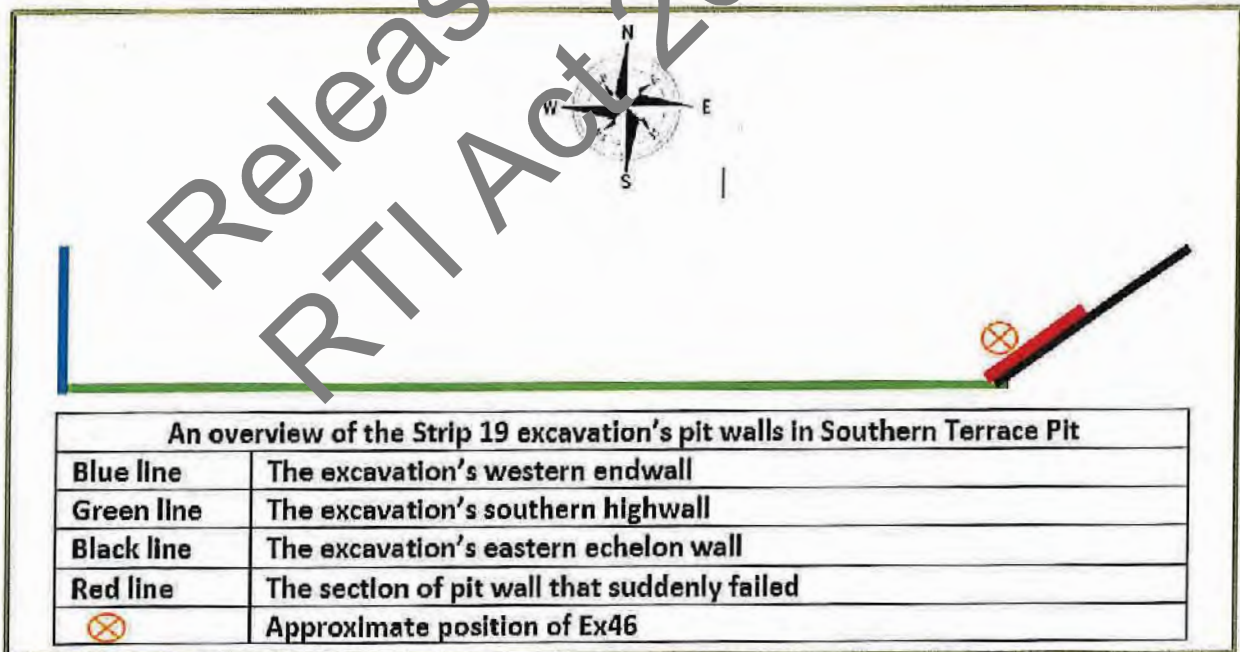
An overview of the Strip 19 excavation pit walls (not to scale)
